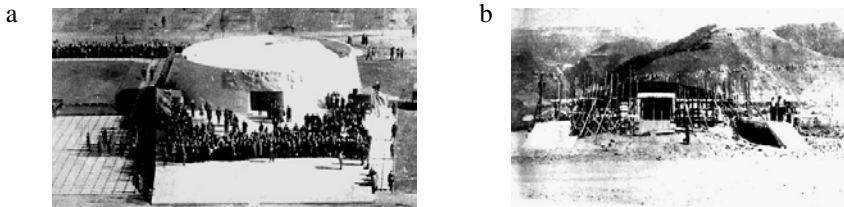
Building of the Museum of Defenders of Caucasian Passes. a - general view, b - view of the construction site.
